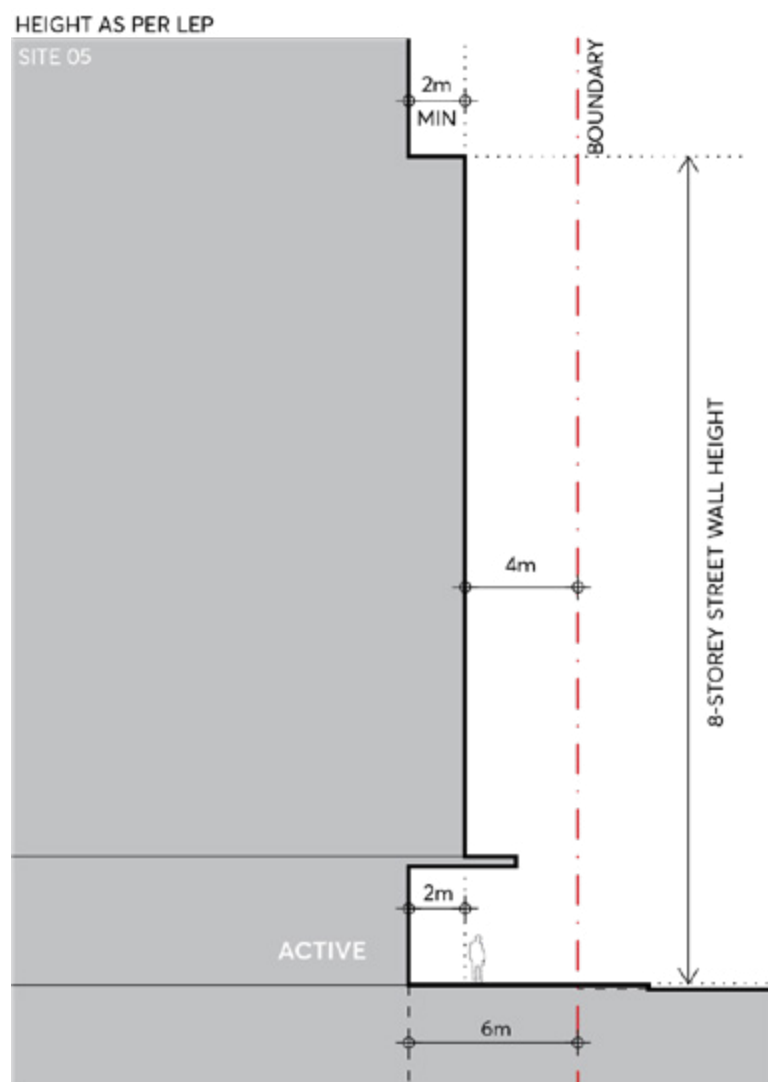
75 George Street at Smith Street (Section G)
